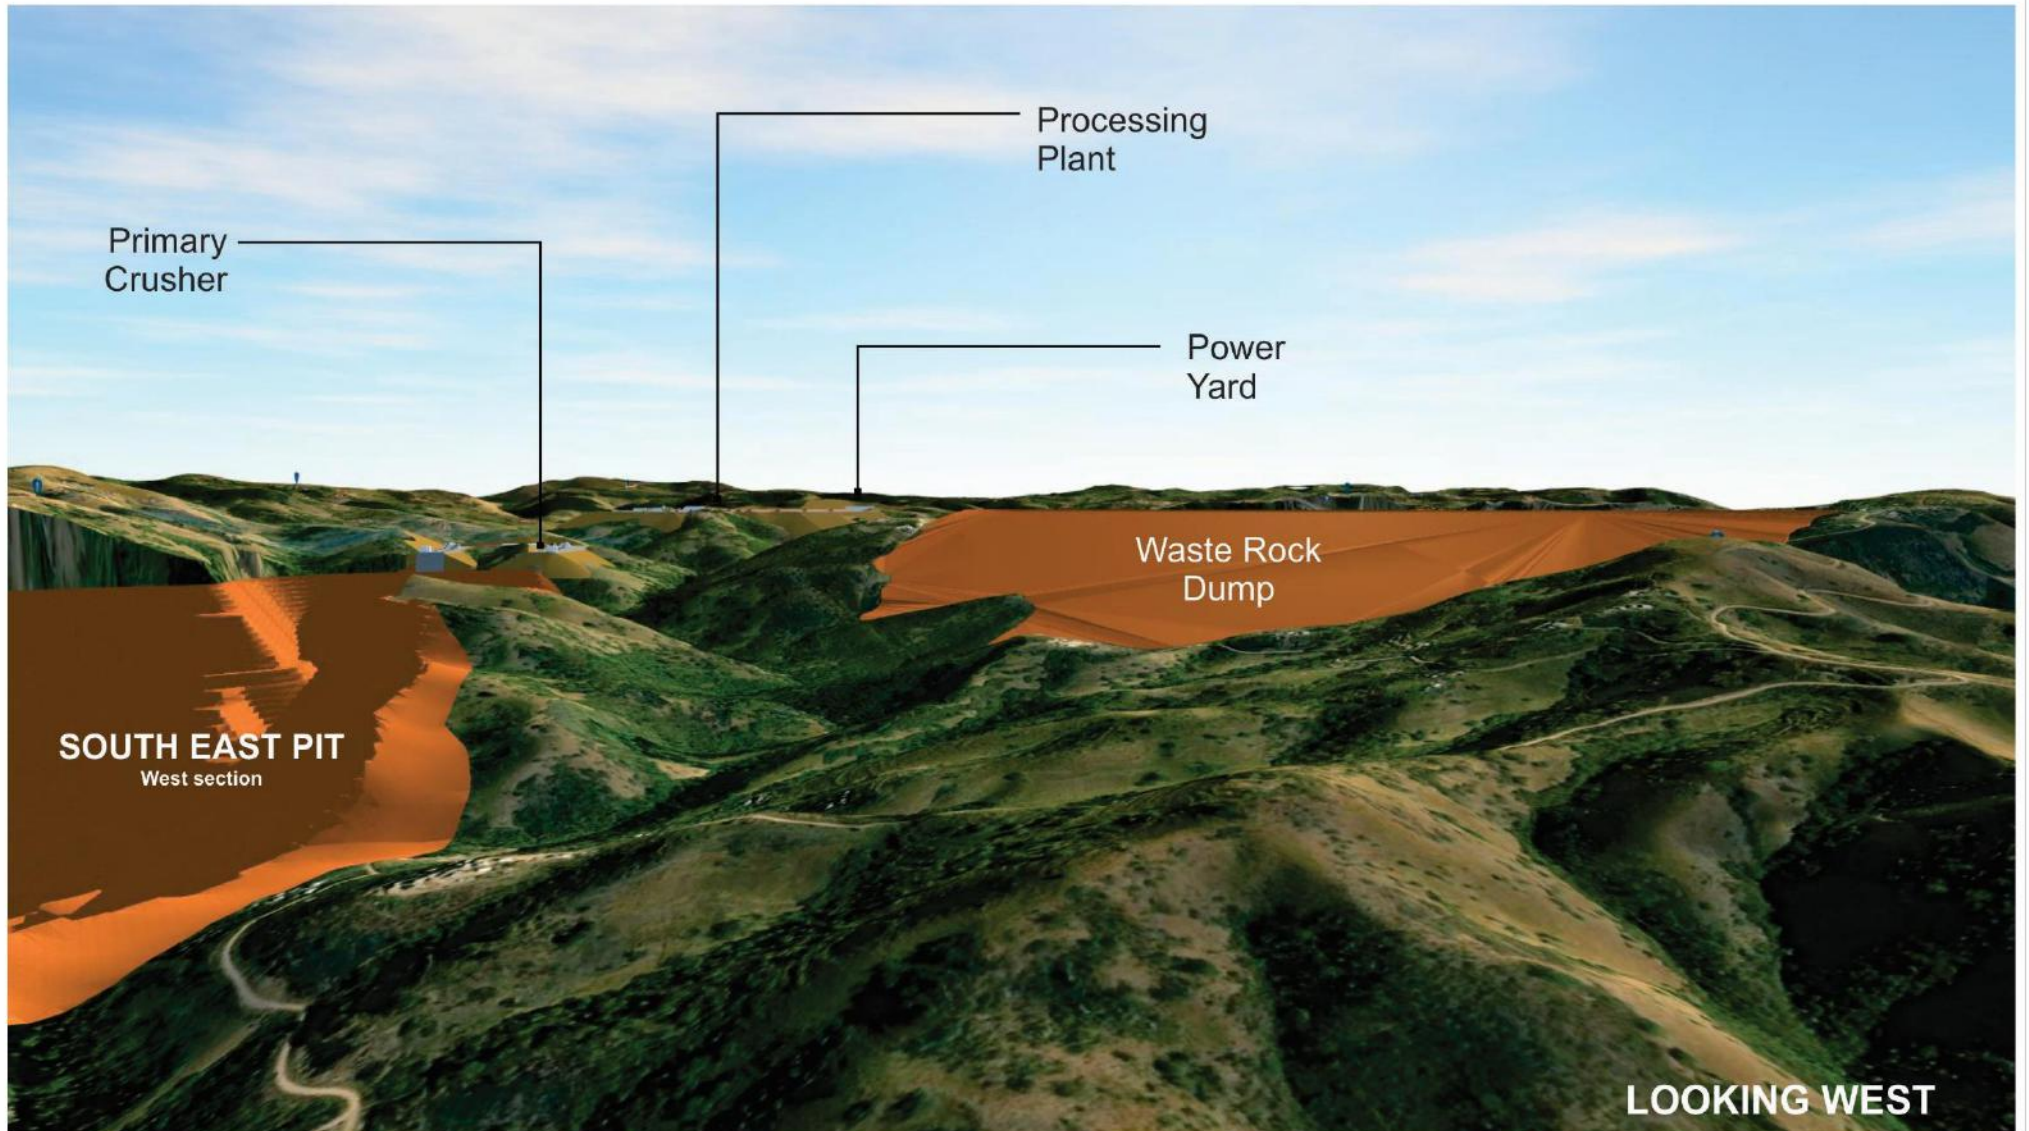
LAYOUT AERIAL - Mine and Infrastructure
